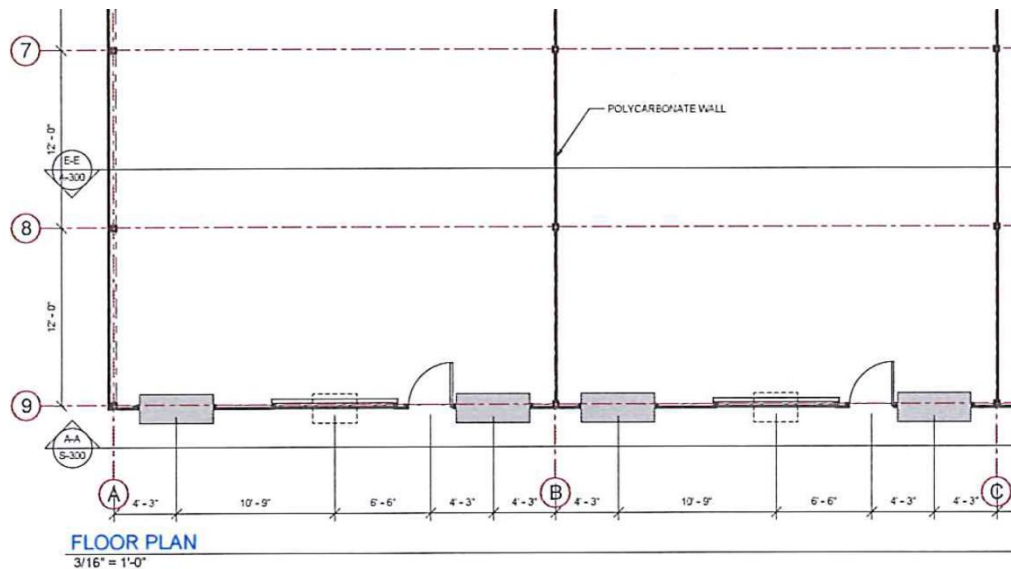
Fan locations, figure from Gro-Tech Floor Plan
